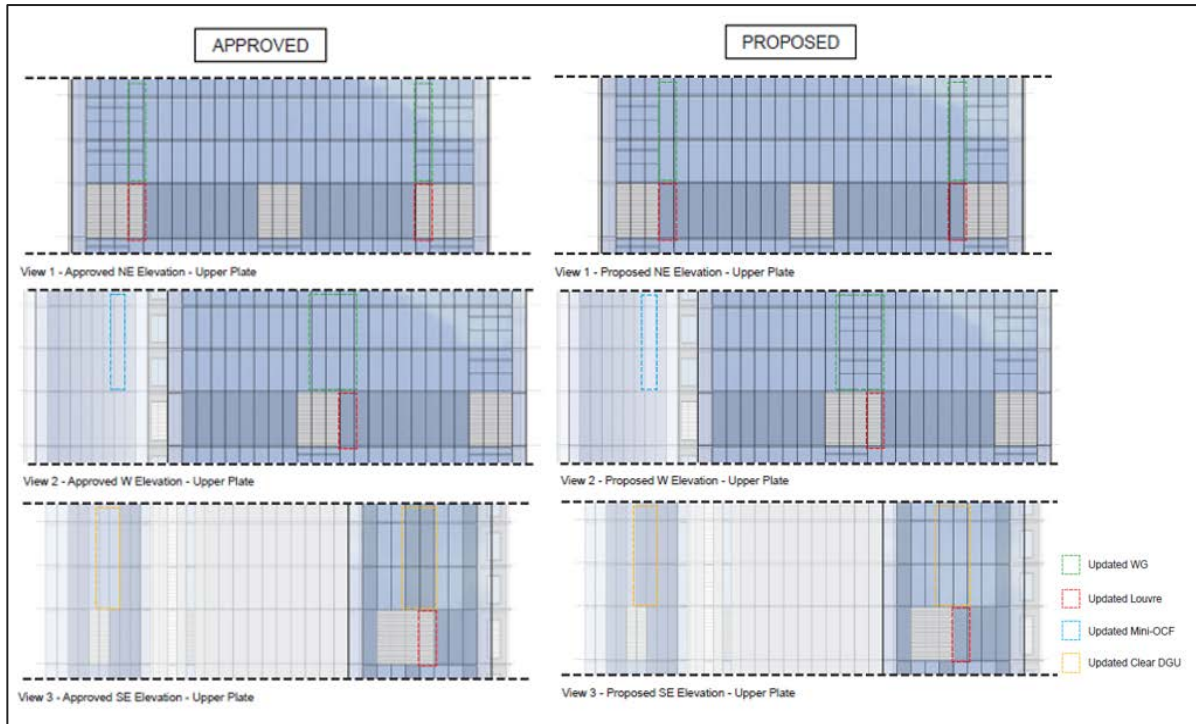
| Façade modifications at levels 48 to 55 (Base source: Applicant's Design report)
